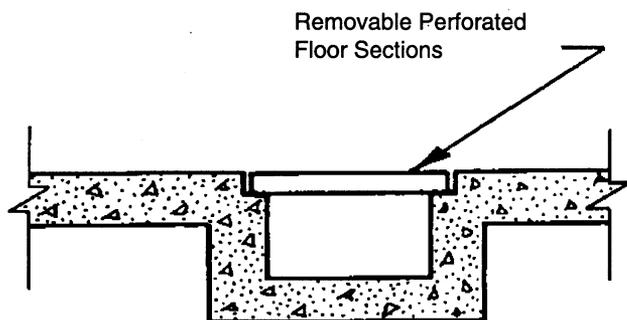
Flush-floor ducts are usually rectangular in cross-section.
